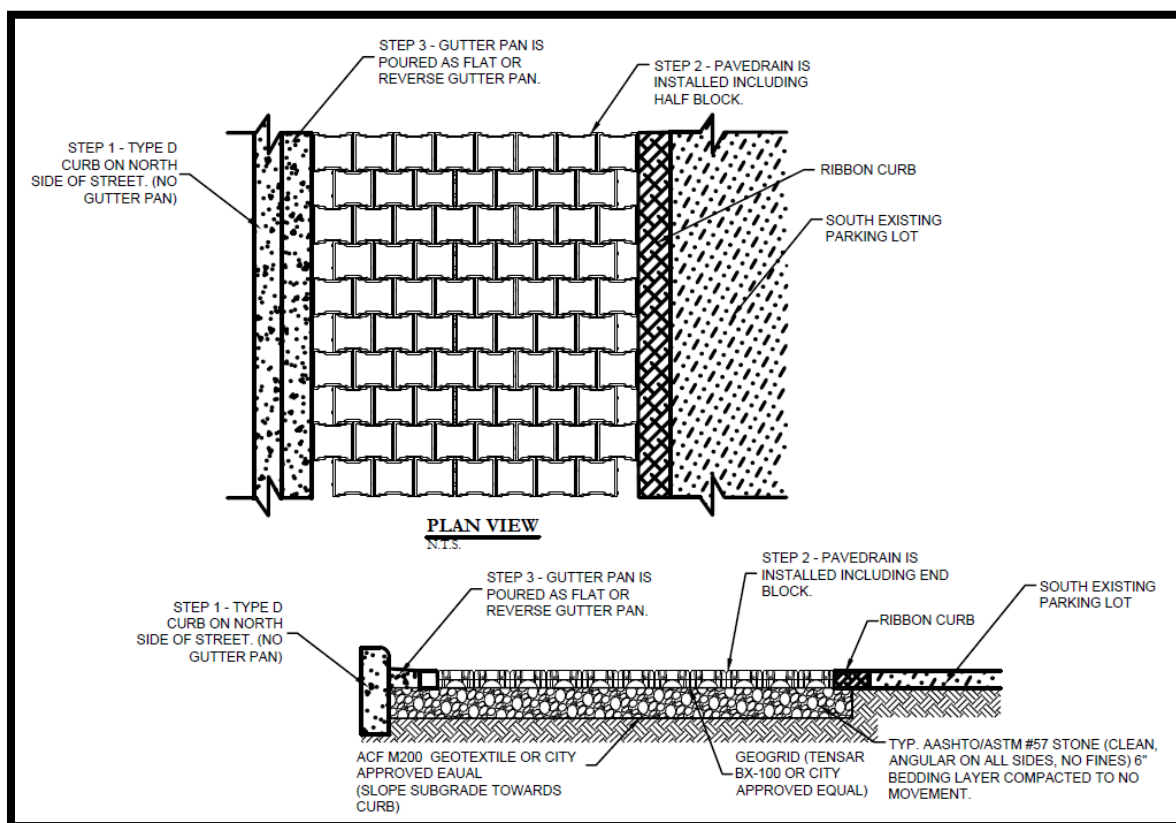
Permeable Pavement Details (Geosyntec, 2021)
